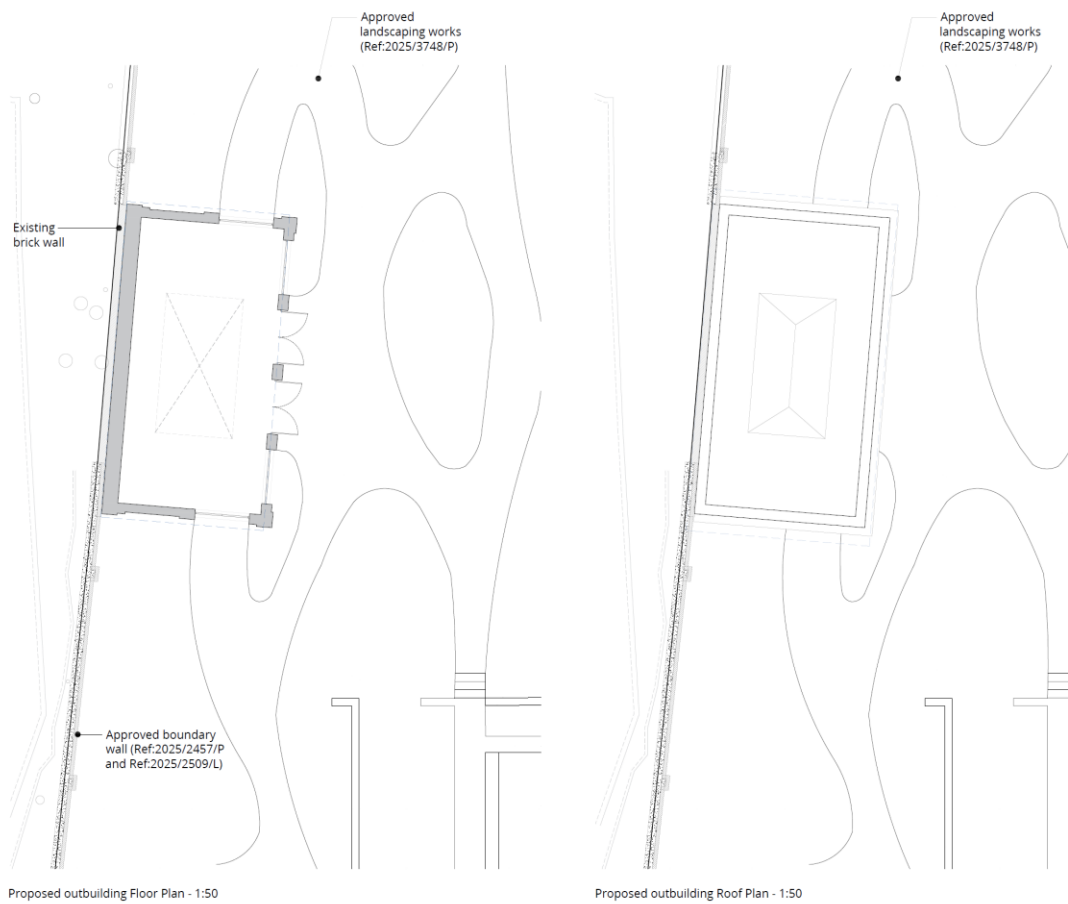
Proposed outbuilding floor plan and roof plan (Source: submitted documents)
